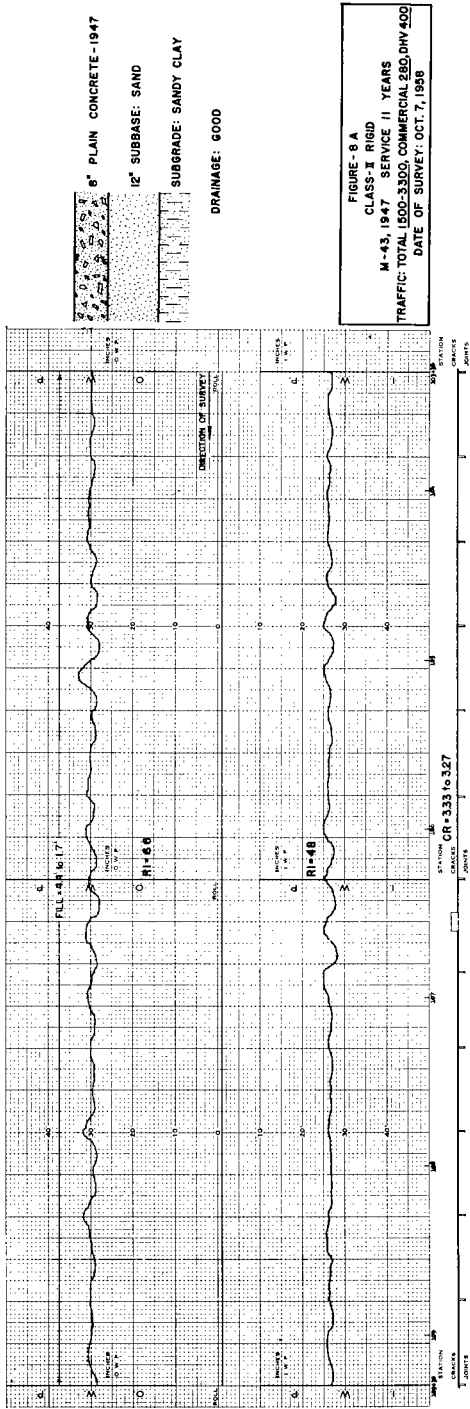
A and 8B, Class II Rigid, Plain and Reinforced Concrete.*—The two pavement sections shown in Figures 8A and 8B provide a direct comparison between plain and reinforced concrete pavements with other design factors substantially the same. This pavement represents one designed to Michigan's present standards, with 12 in. sand subbase over a clay subgrade, good drainage, and subjected to fairly heavy traffic. Both sections are in excellent condition and would be rated very good or exceptionally smooth, with the slightly better performance in favor of the reinforced concrete. The service life of 11 years is rather short, but is long enough to reveal any serious weakness in the pavement. Structural continuity is still high, with the absence of cracking in the plain concrete a function of the 50-ft slab length as compared to the 100-ft slab length in the reinforced section. In both cases the high-capacity foundation with the 12-in. well-compacted sand subbase is the major factor in the excellent performance of both plain and reinforced sections. The
